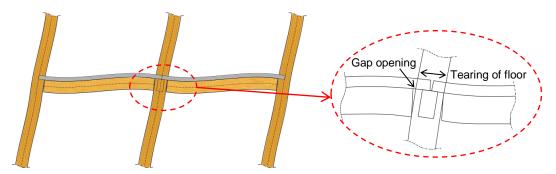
Tearing of the floor due to frame elongation resulting from beam-column-joint gap opening
